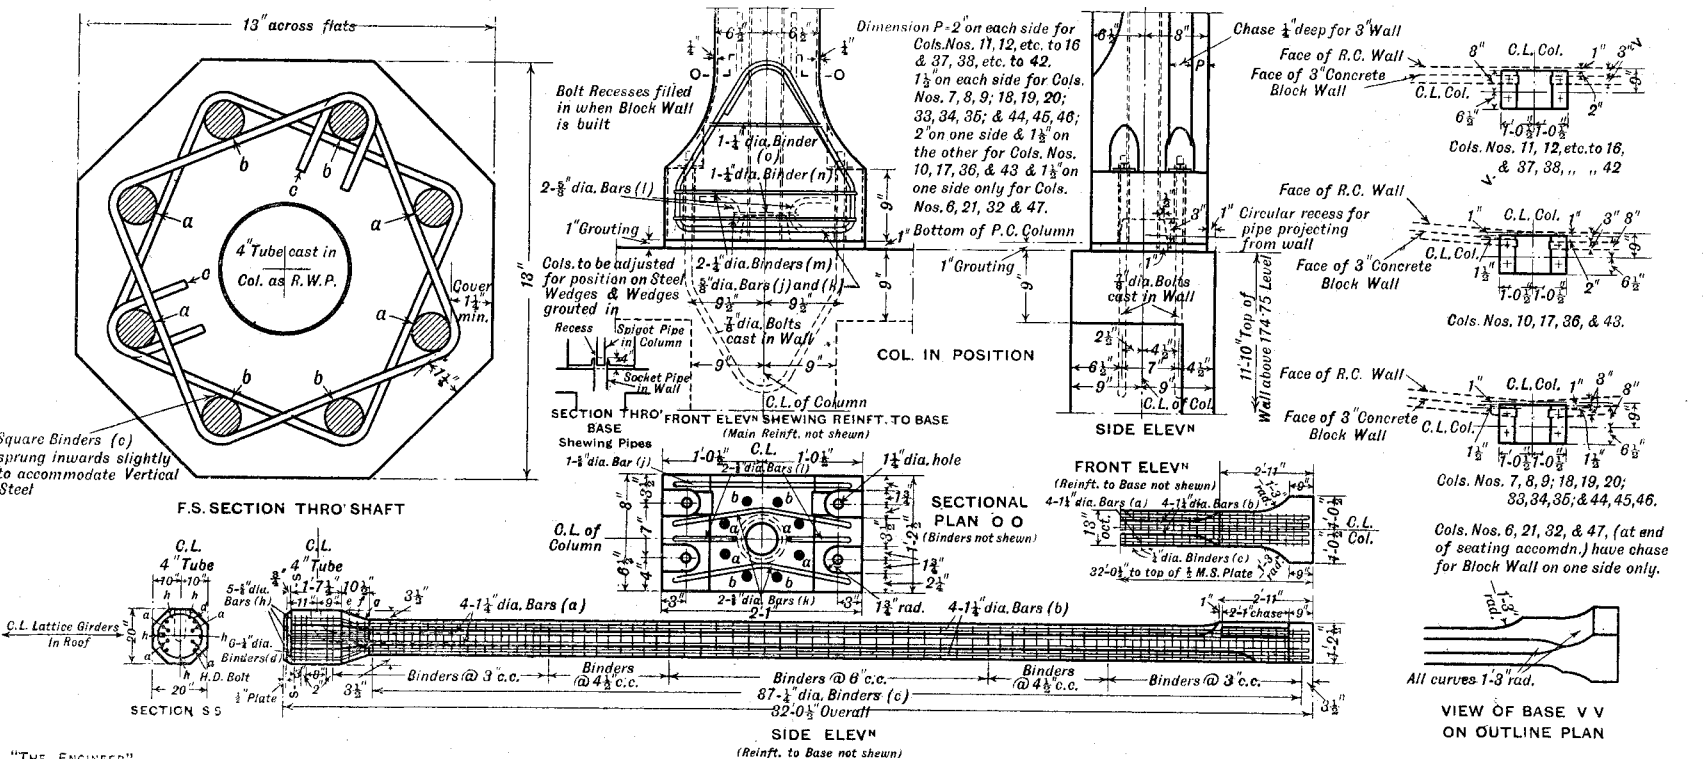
DETAILS OF REINFORCED CONCRETE ROOF-SUPPORTING COLUMNS
